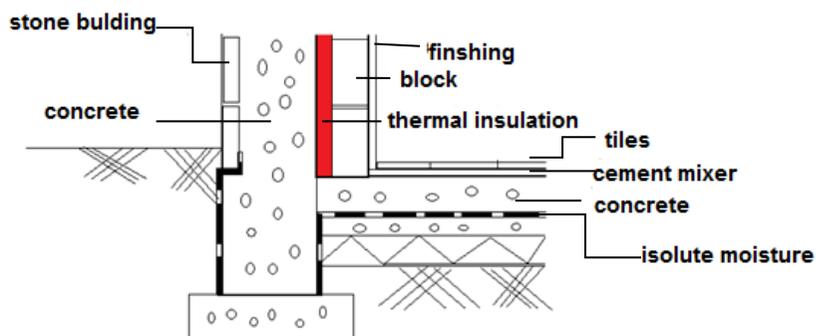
Heat transfer through concourse external walls with floor (Alaaysh1990)
